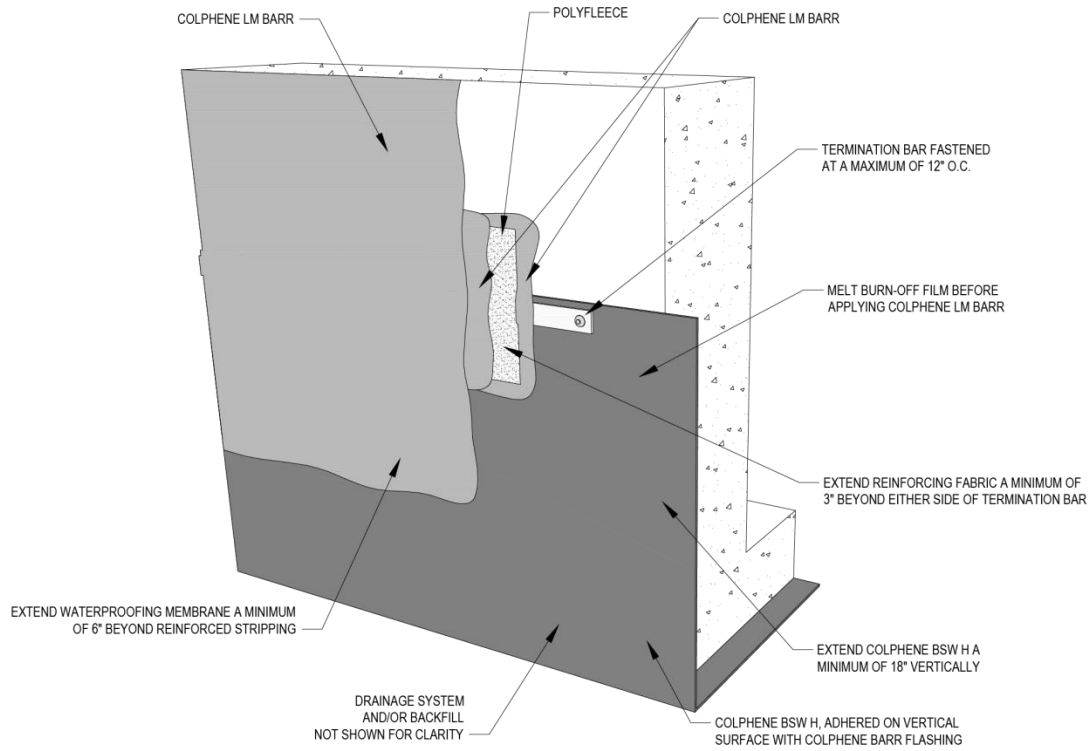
Non-reinforced Tie-In to Blindsided Waterproofing Membrane
